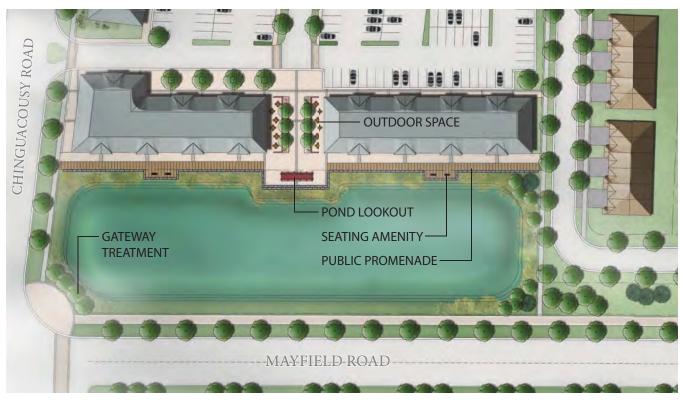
Conceptual plan showing the stormwater pond with an urban treatment serving as an important amenity for the commercial area while providing a 'green edge' transition along Mayfield Road.
